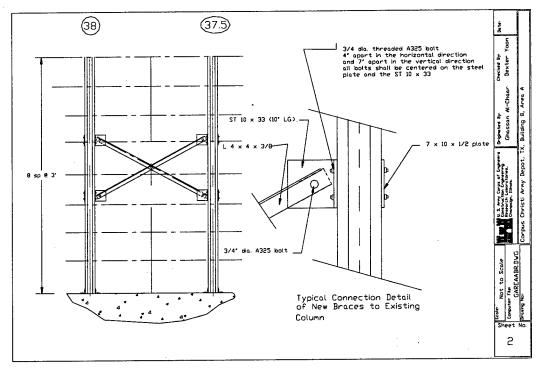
Proposed braces for bay 37.5-38 along column line M.
